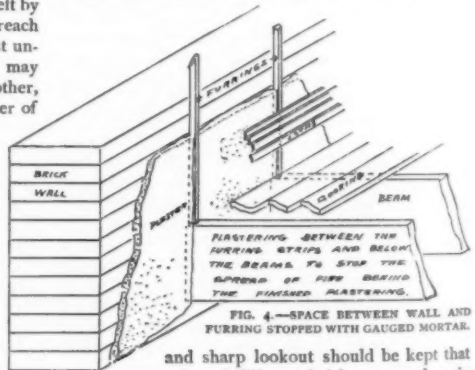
SPACE BETWEEN WALL AND FURRING STOPPED WITH GAUGED MORTAR.
